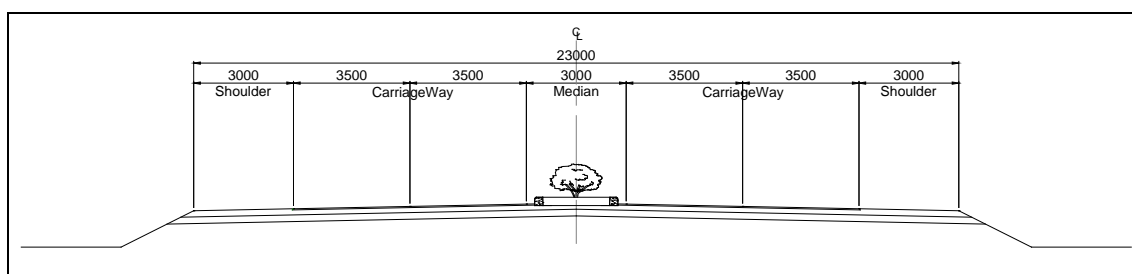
Proposed Typical Cross Section of Kampong Chhnang Bypass
